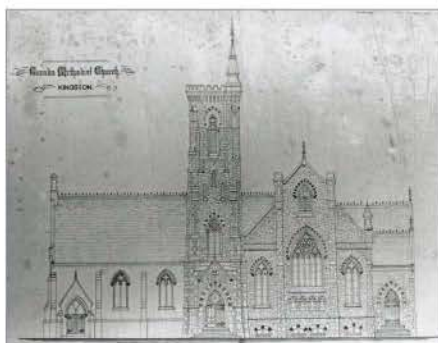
COMPETITION SOUTH ELEVATION DRAWING OF THE QUEEN STREET METHODIST CHURCH, ARCHITECT JOSEPH POWER, 1882. THIS DESIGN WAS NOT SELECTED. THE FIRST THREE BAYS FROM THE LEFT SHOW THE 1864 CHURCH. | POWER COLLECTION, LAC.
